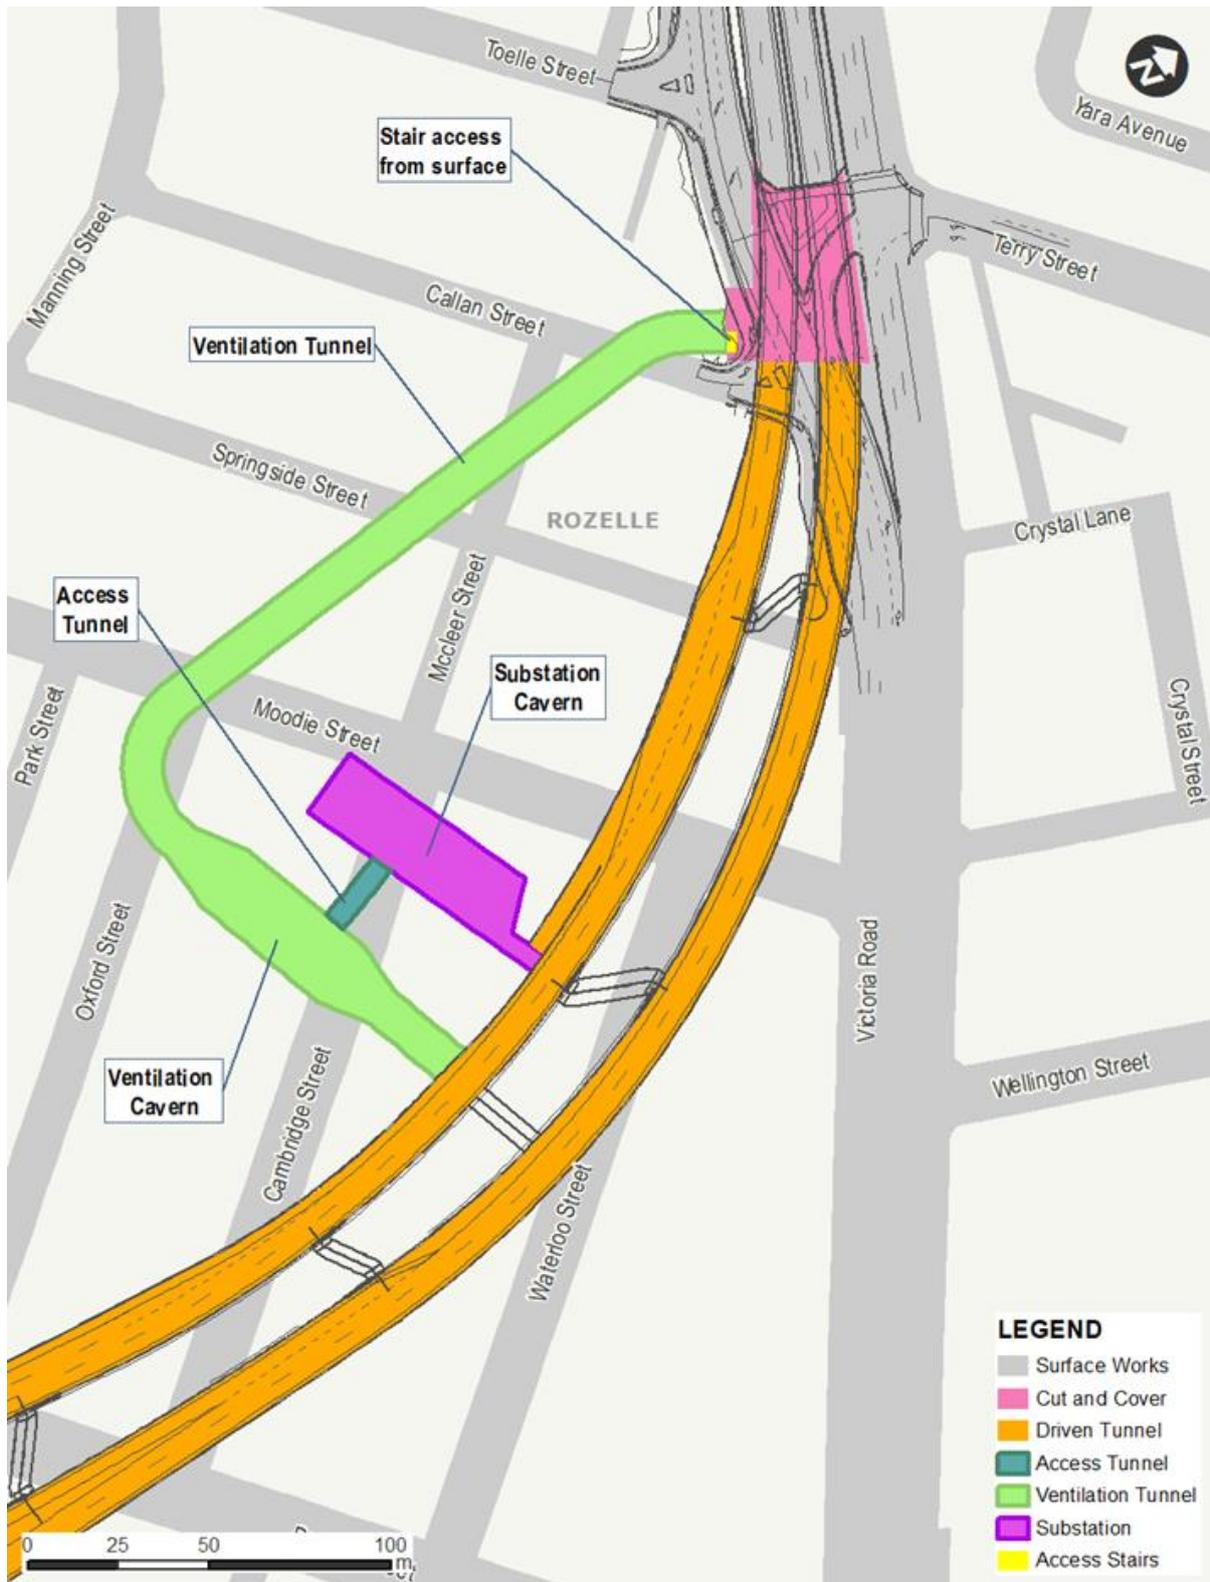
Proposed ICL Ventilation Ancillary Facilities – underground layout
